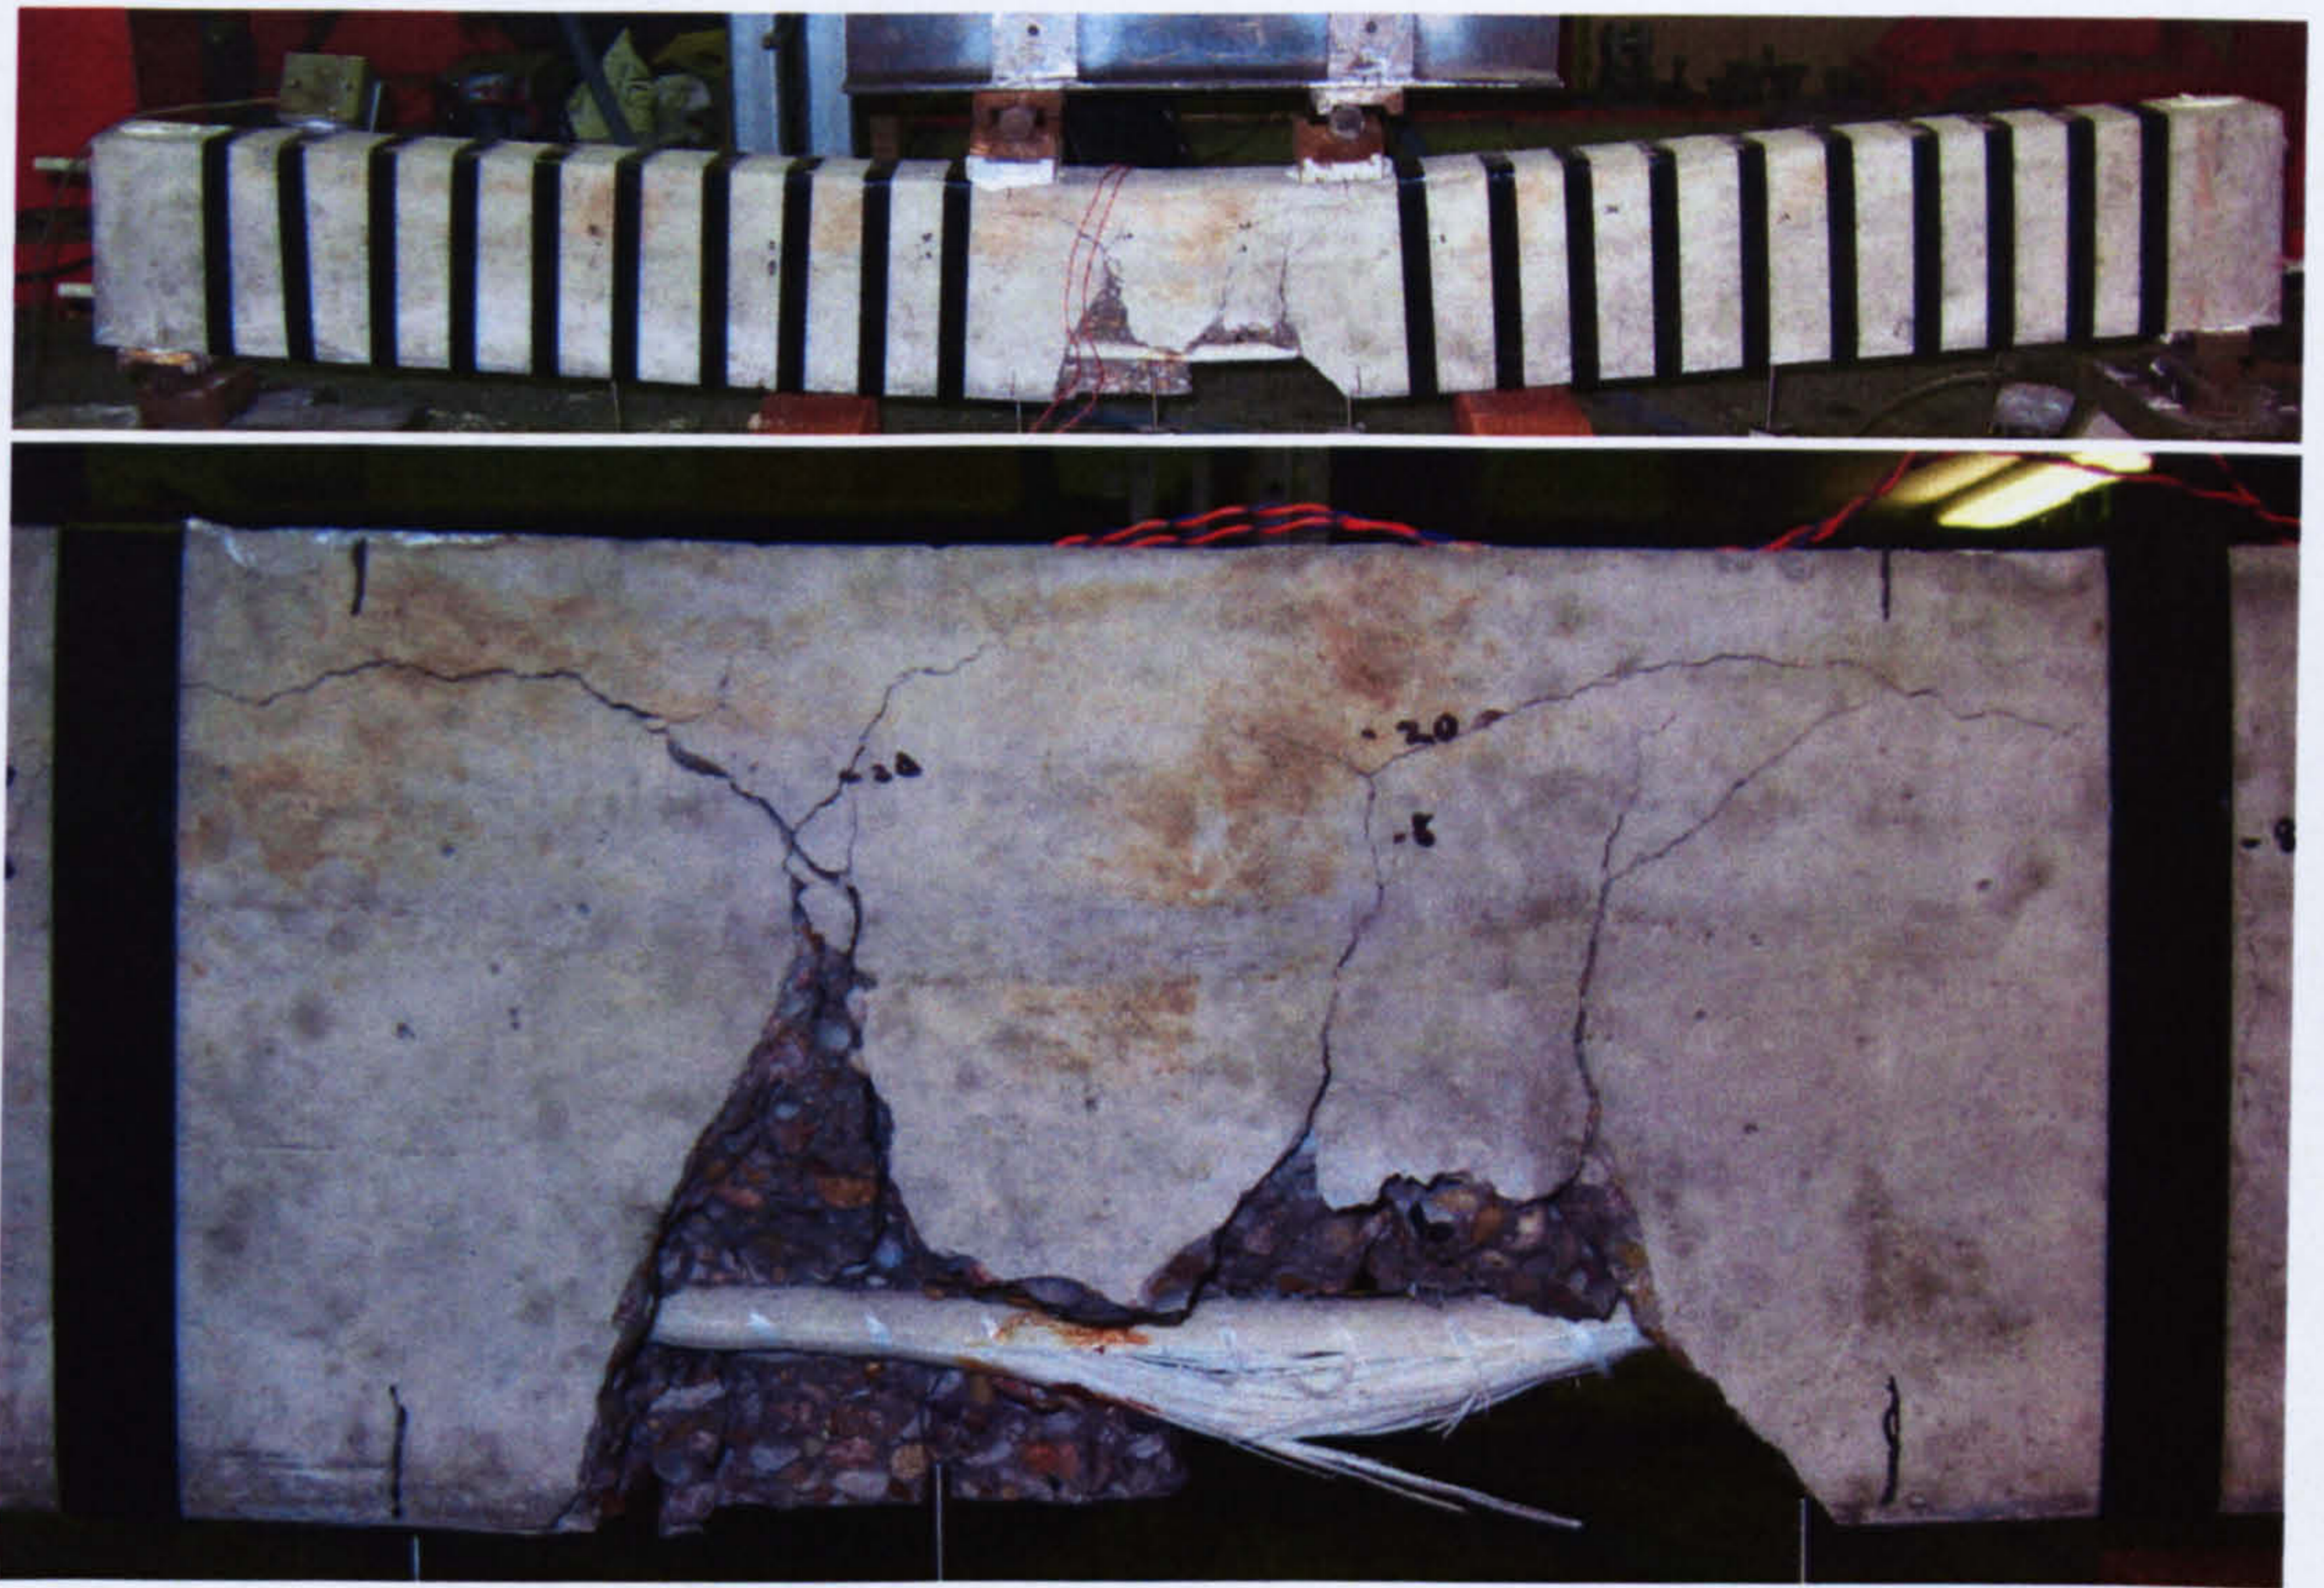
Failure of Beam B1 triggered by reinforcement rupture
